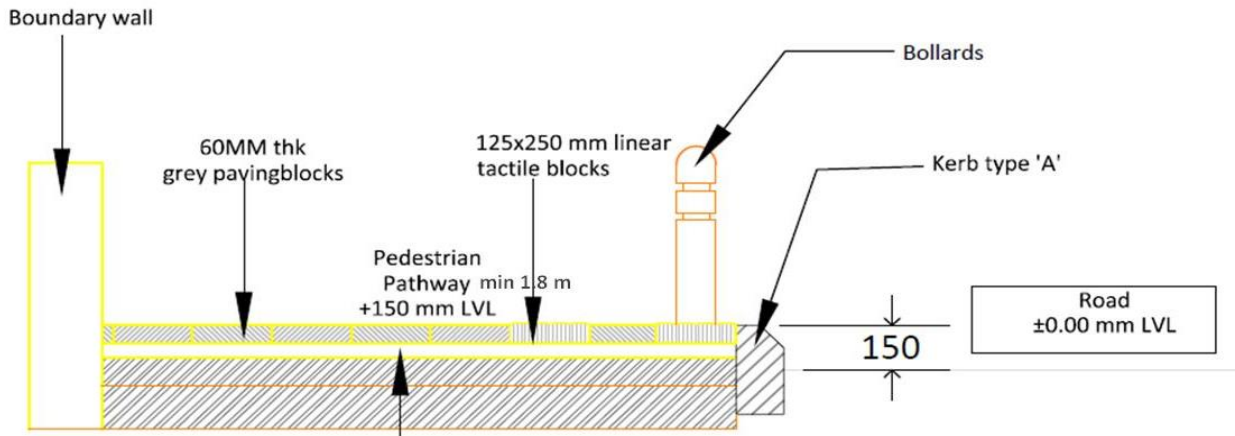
DETAILED CROSS SECTION OF FOOTPATH DESIGN
